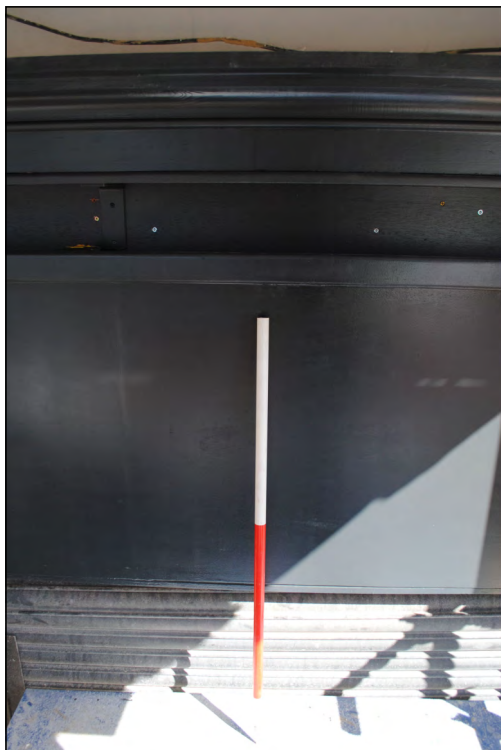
View looking NNW at detail of upper architrave over the main entrance to The Rabbit.
